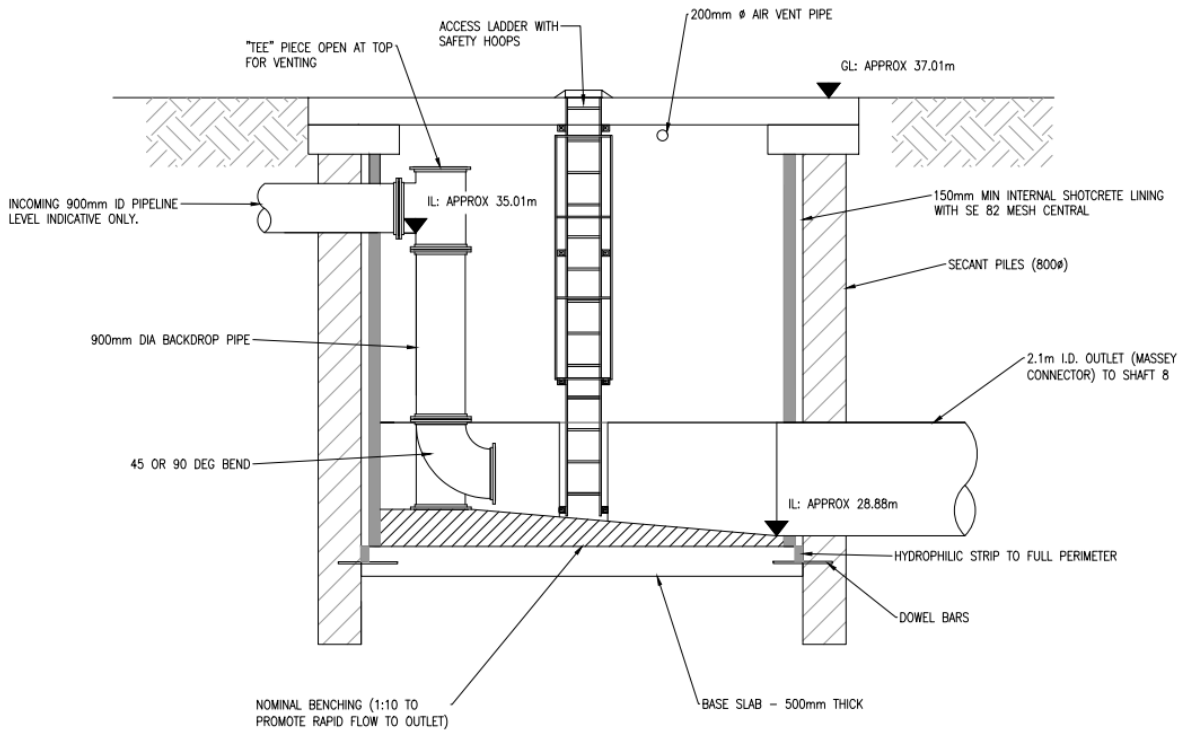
Cross section view of the break pressure chamber (snip from Drawing 2013661.801, Mott MacDonald, provided in Appendix A).
